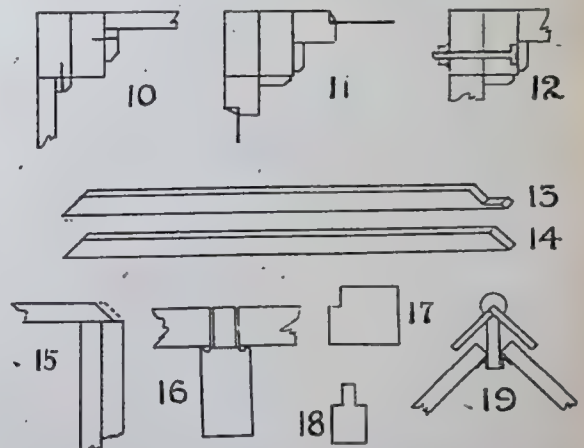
, Side and End Boarding with Fillets. Fig. 11, Corner with Side and End Lights in position. Fig. 12, Method of fixing Sections together. Fig. 13, End Rafter. Fig. 14, Intermediate Rafter. Fig. 15, Top Plate cut back to take End Rafter. Fig. 16, Rafter with Roof Light in position. Fig. 17, Section of Roof Light Framing. Fig. 18, Section of Bar. Fig. 19, Section of Top of Roof.
